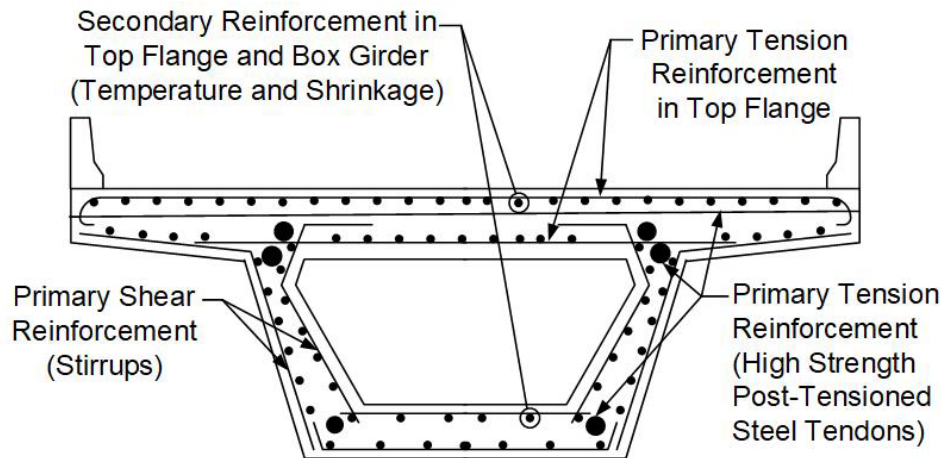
Steel Reinforcement in a Concrete Box Girder
